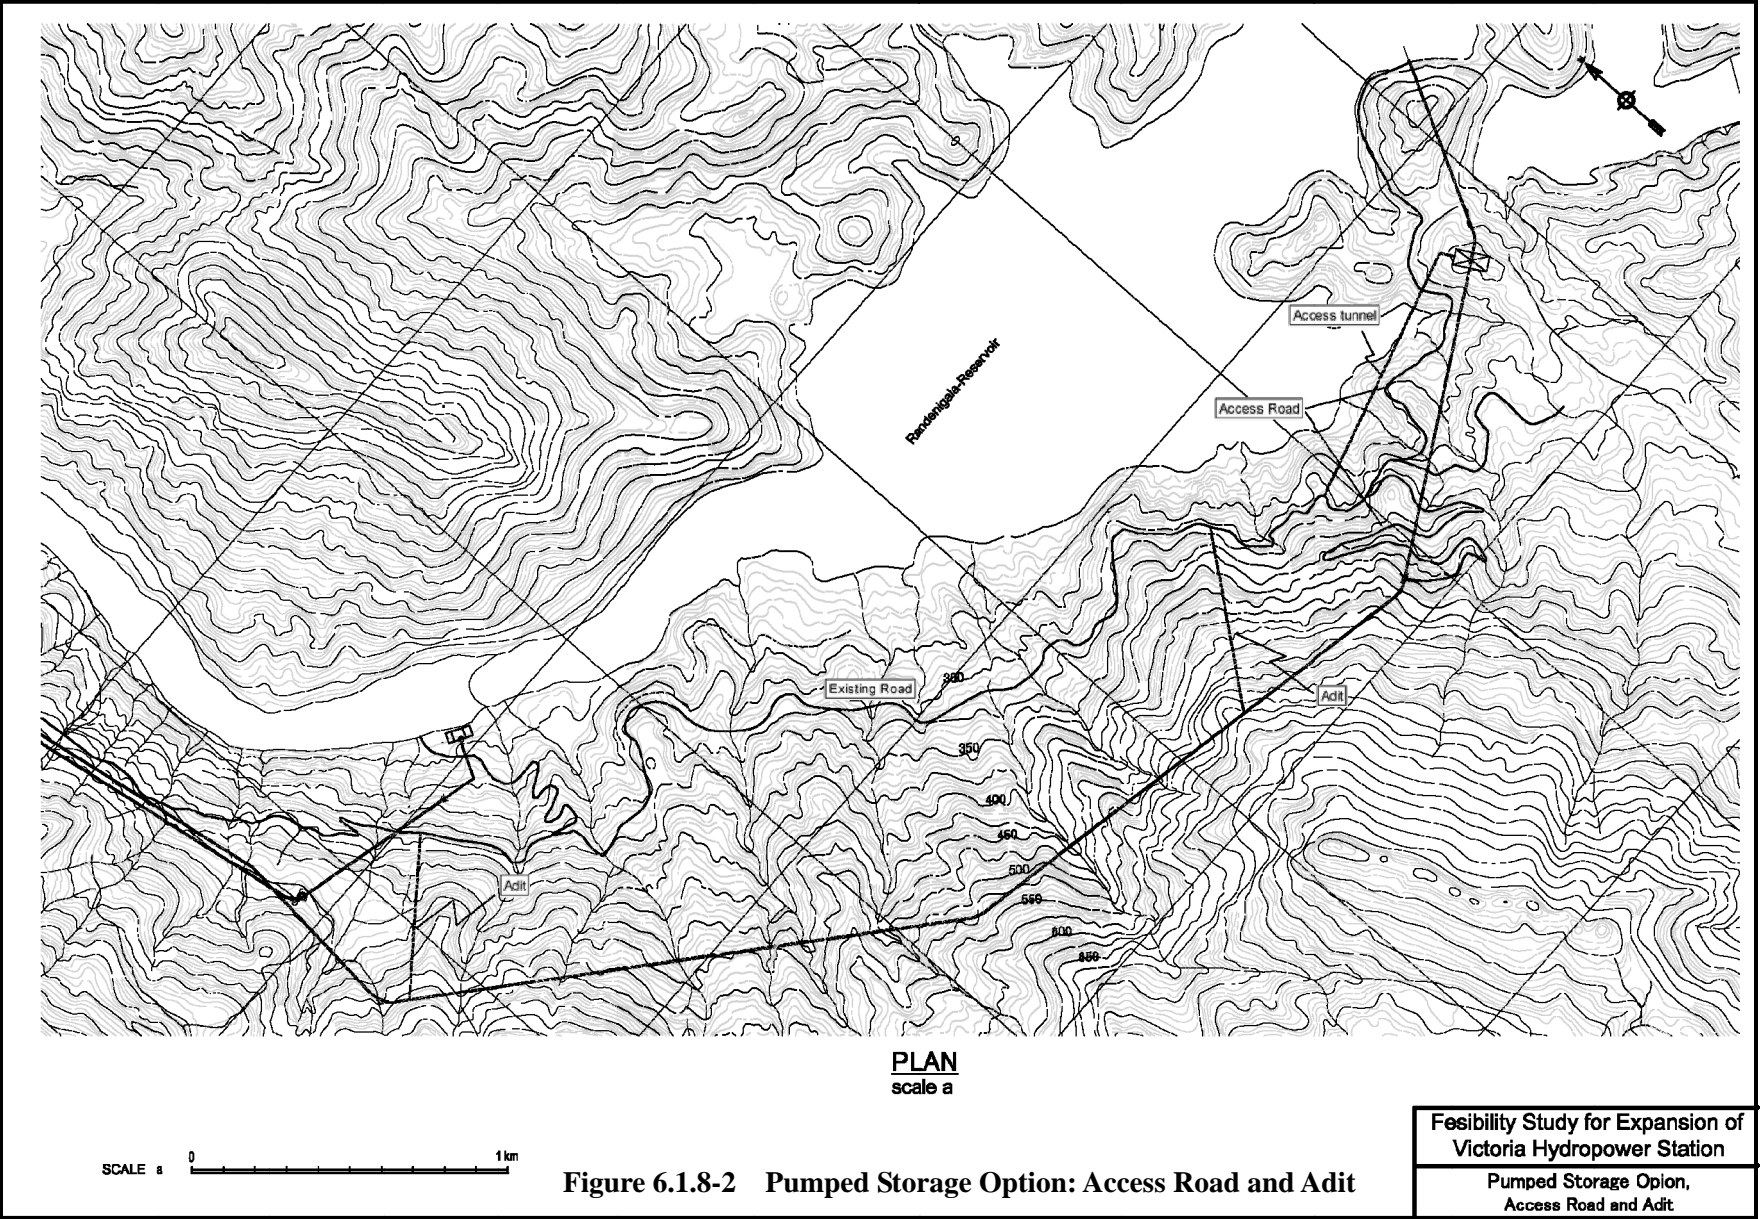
Pumped Storage Option: Access Road and Adit
